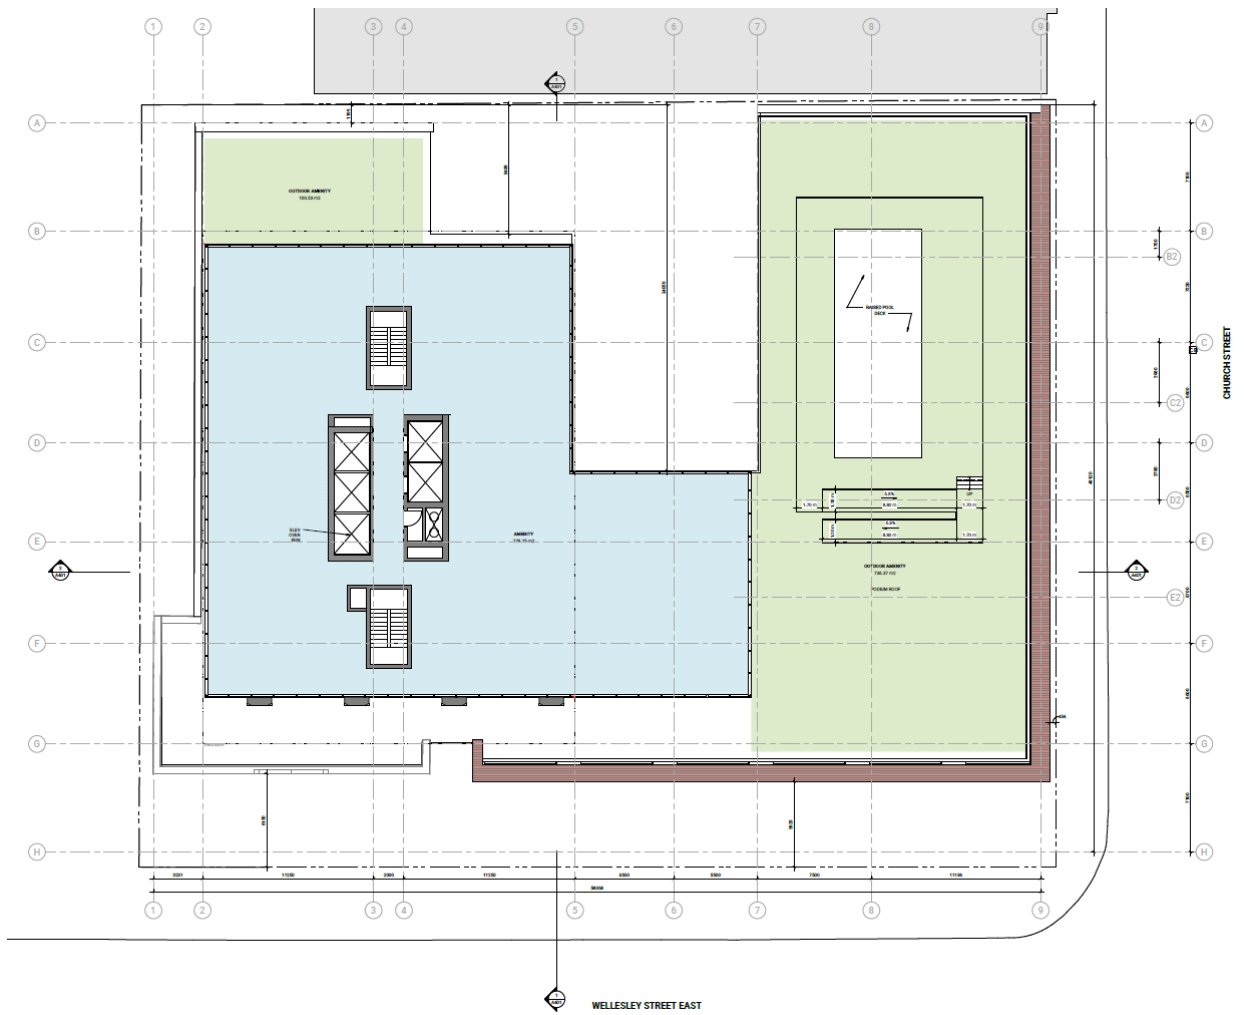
Level 5 floor plan for 64 Wellesley Street East included for illustration purposes (ERA Architects Inc., March 3, 2026).
